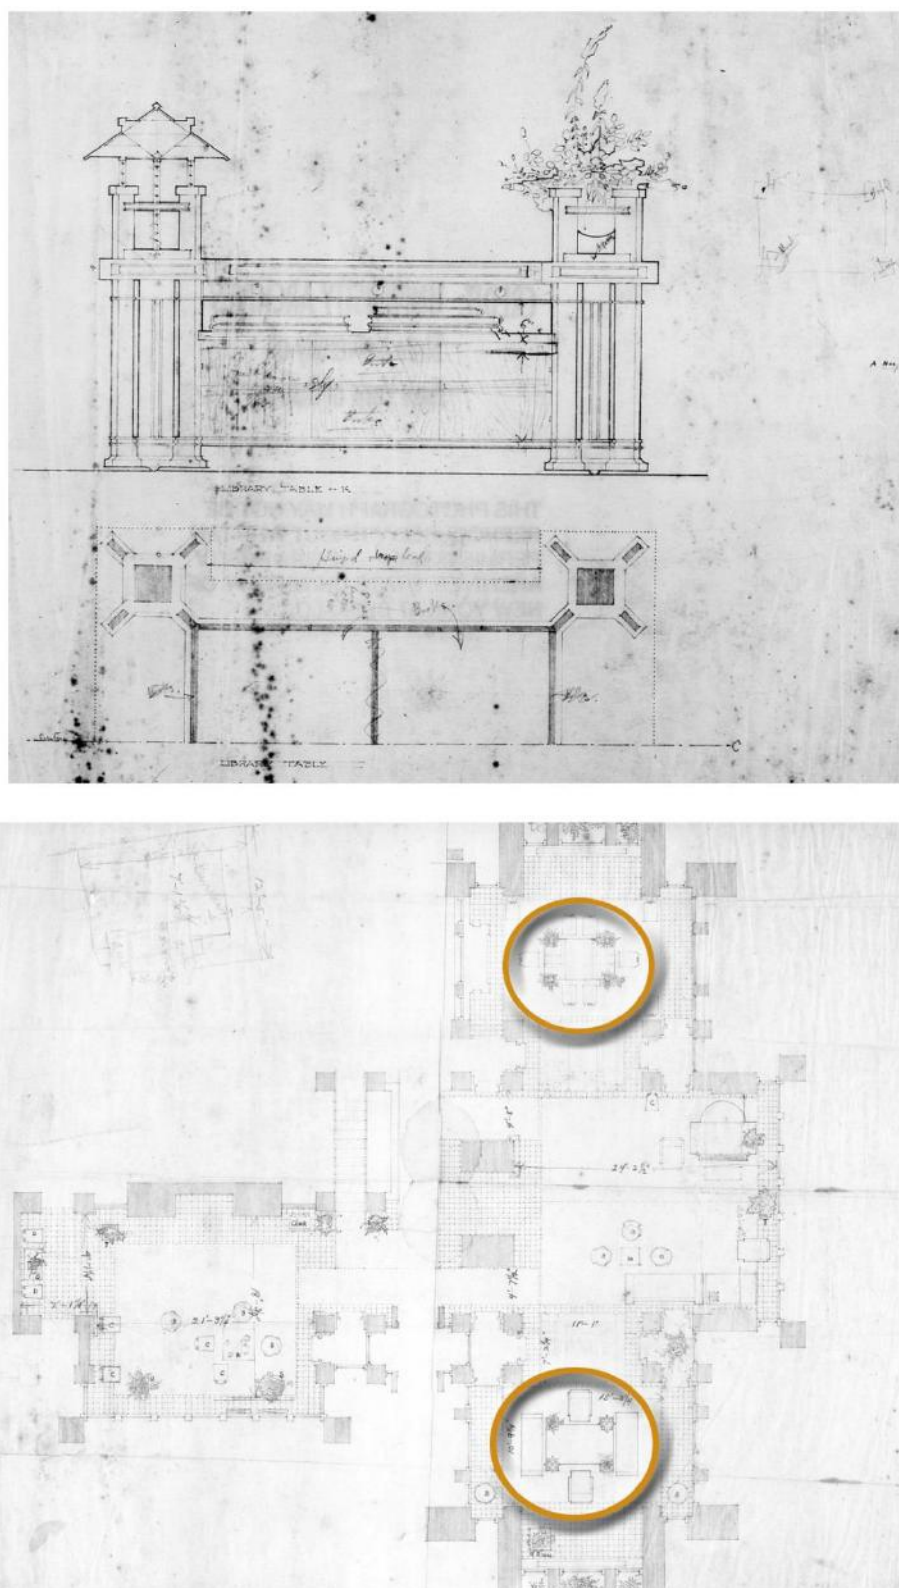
Top: Wright's presentation drawing for the library table showing stanchions supporting a lamp and plants. A similar drawing exists for the dining table. Bottom: Wright's Martin House first floor plan. The library table (bottom) and the dining table (top) are circled. These drawings are not adequate working drawings and do not portray all the details. ©University Archives, State University of New York at Buffalo.
